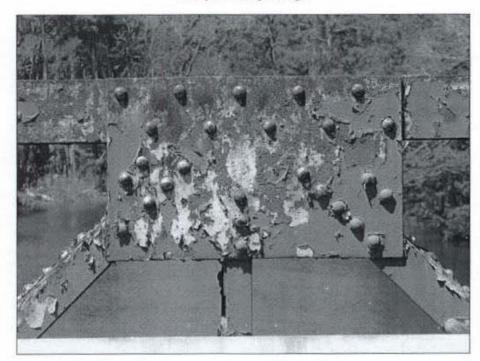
Roll 2702-1, Exp. 4; Approach Span, Facing North
